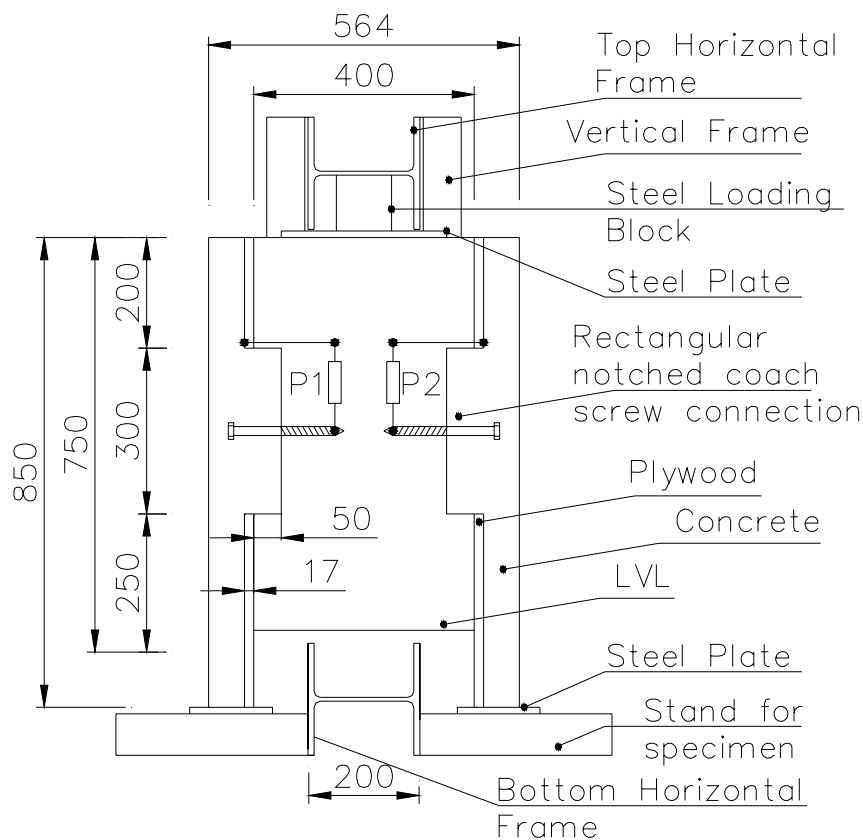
Set-up of specimen in lever frame and locations of potentiometers (dimensions in mm)
